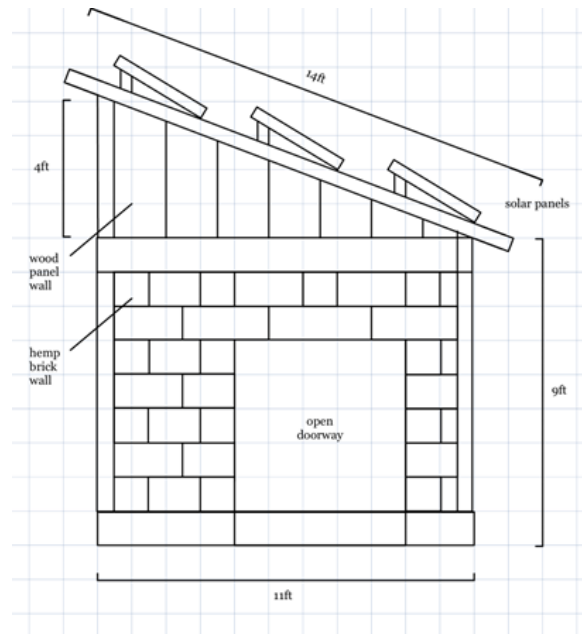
Hempcrete brick wall exterior of Bike Coop as seen from the front– digital drawing.
